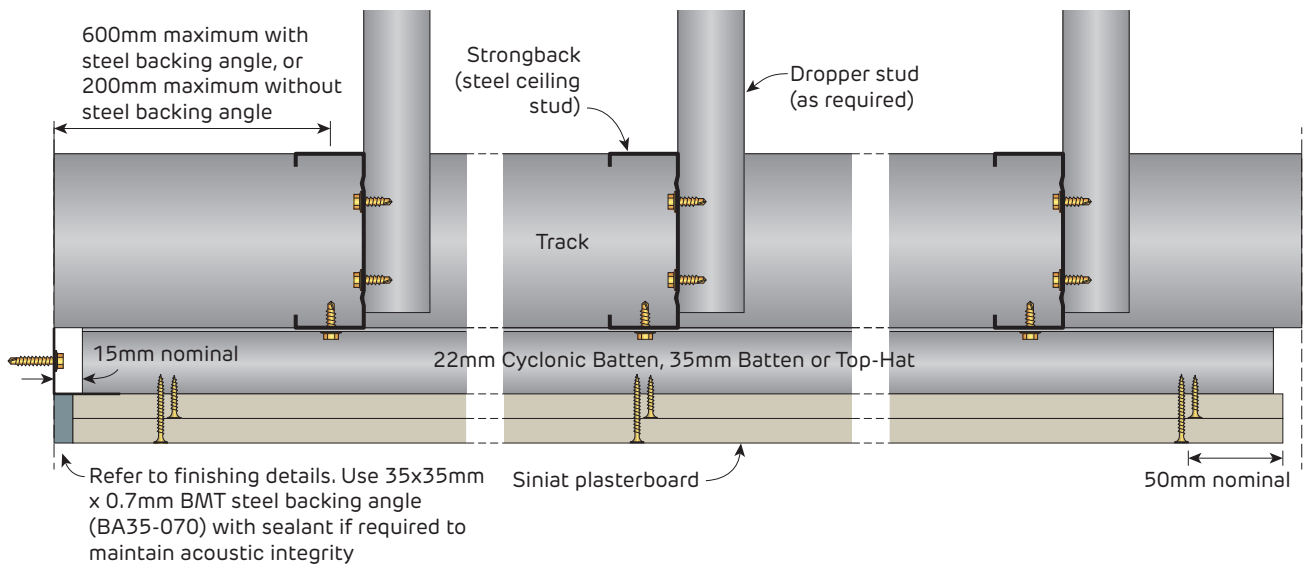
Stud Ceiling Type A3 - Fixed / Sliding
